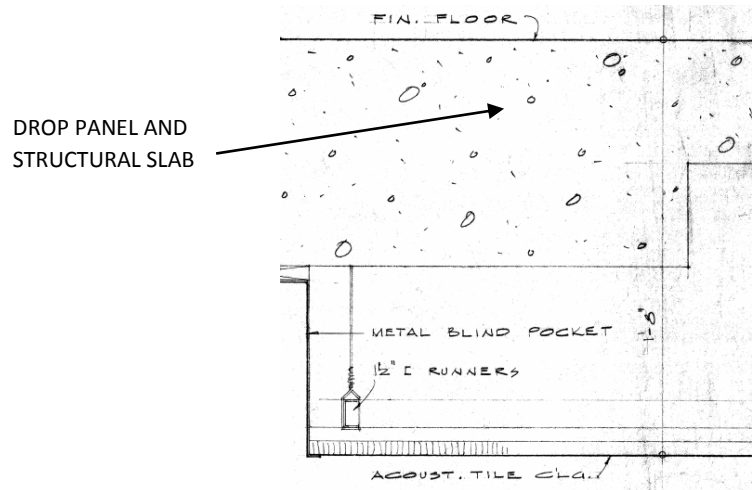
Section through typical floor in existing building. From A.12: Window & Wall Sections
